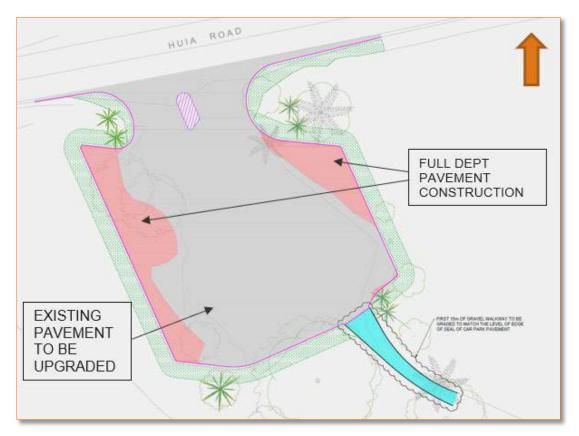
Areas of pavement construction. (Source: Stantec Drawings)
